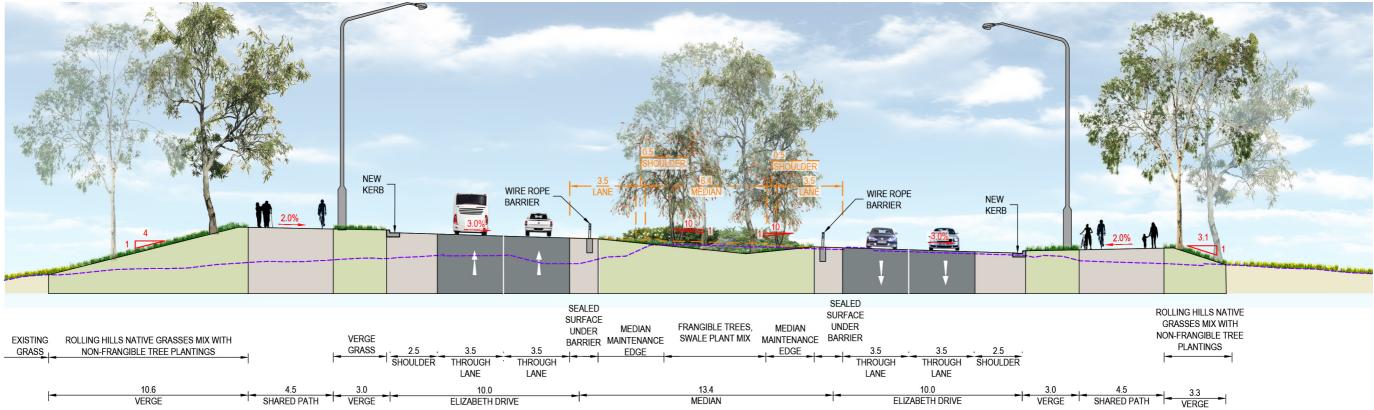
Section 01 - Typical Typology 'Rolling Hills' (Approx. CH 500)
